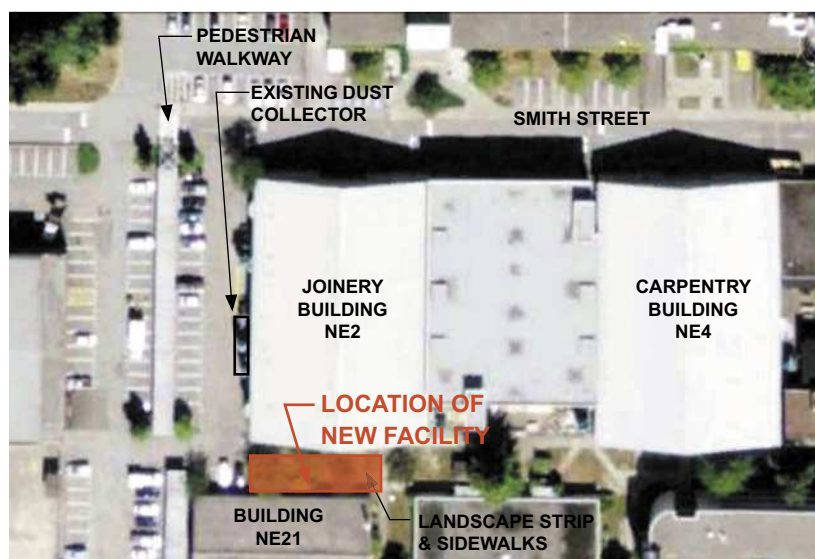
Existing Site Plan, proposed location for Biomass boiler facility
